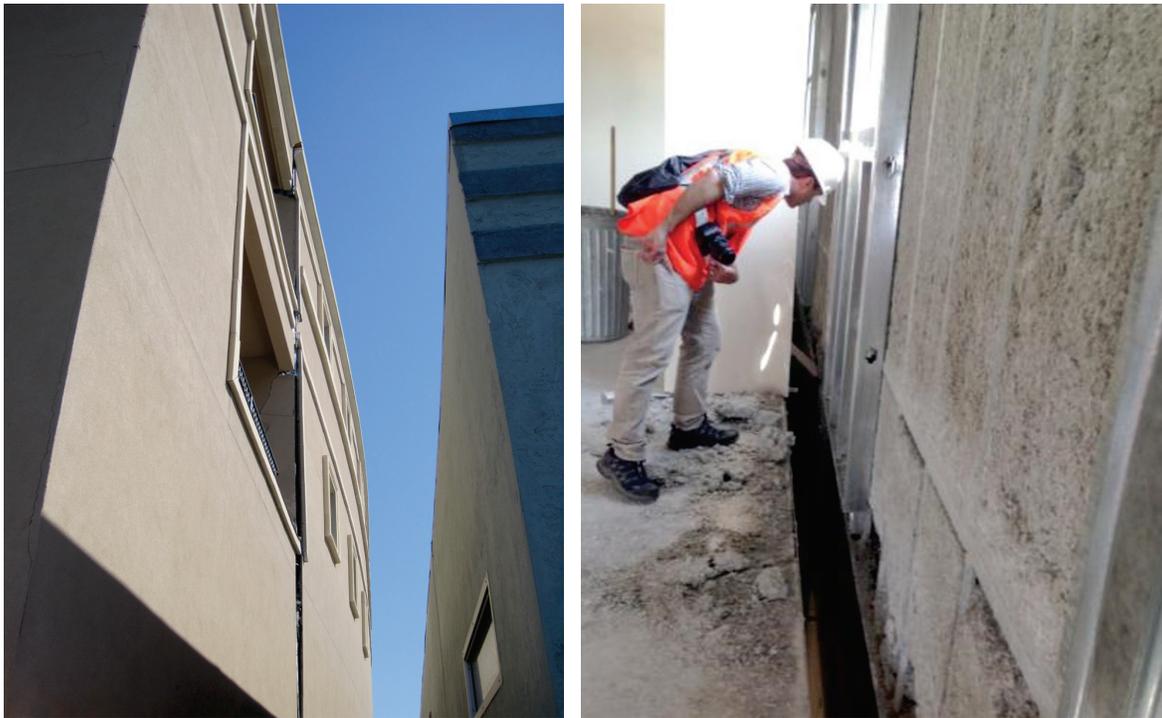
Bowed wall separated from floor (photo on right from Lauren Biscombe).
